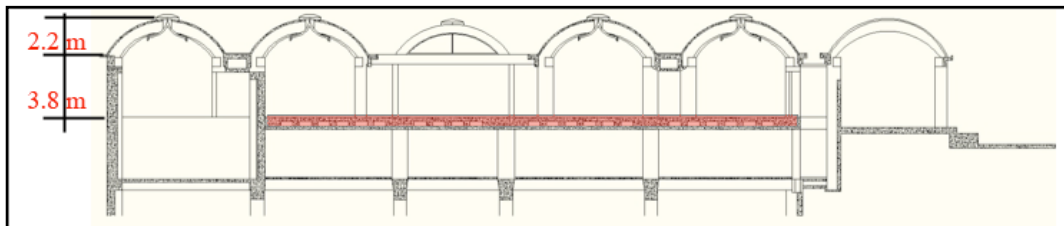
Section, showing hollow slabs (Drawn by Author)
